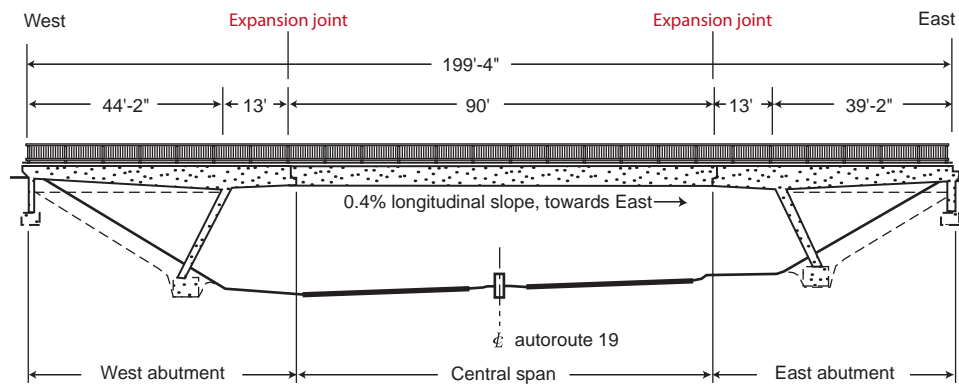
Elevation View of the de la Concorde overpass from Autoroute 19
